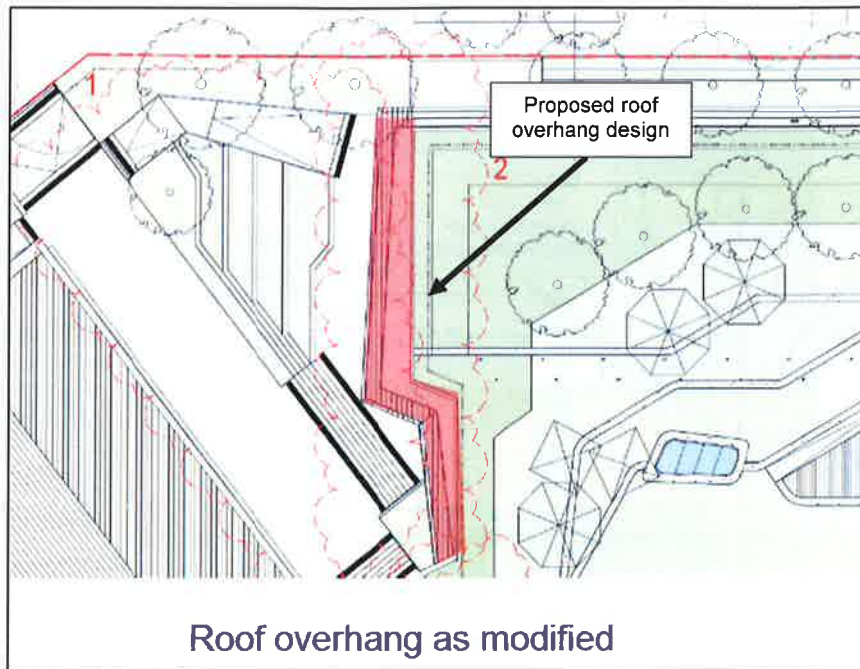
Proposed roof overhang in red (Source: Applicant's Modification 1 EIS)
